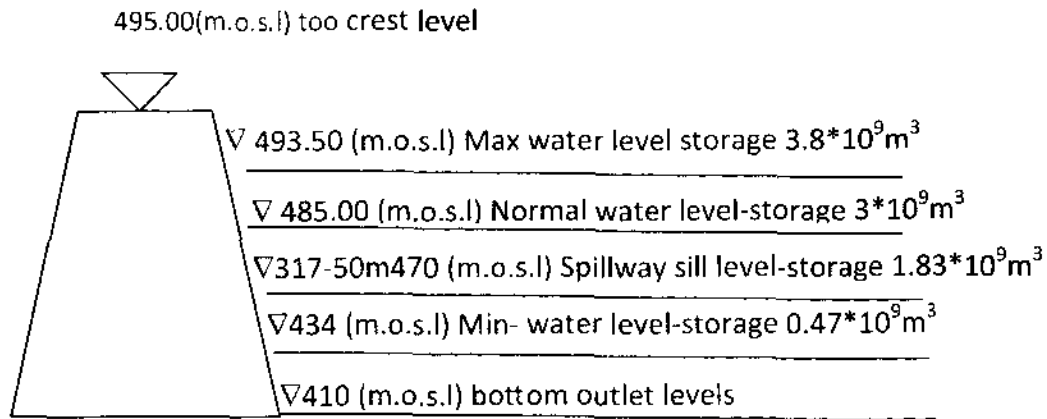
Elevation of DERBENDI-KHAN Dam
